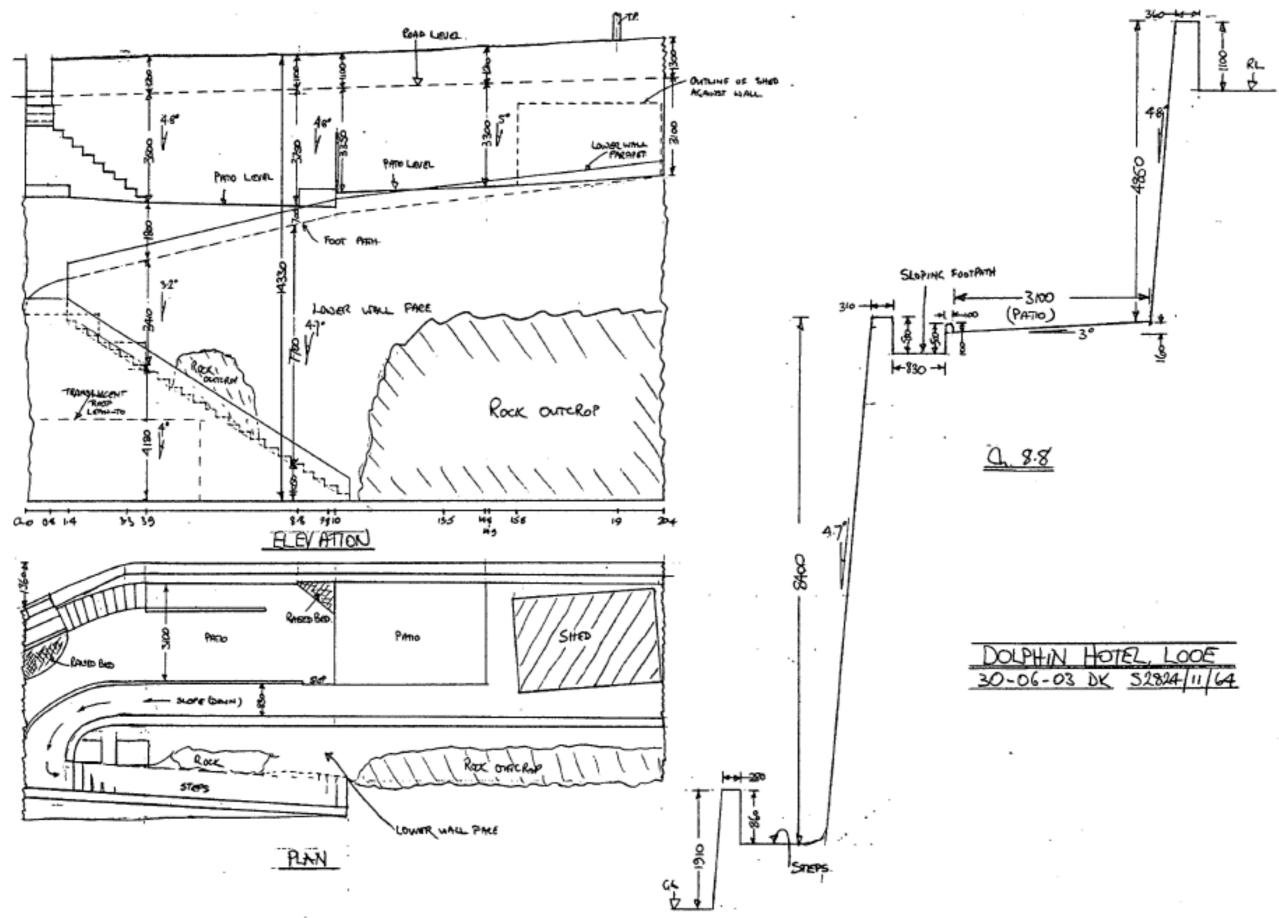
Sections N, O and P west elevation drawing, plan and section (2003d).
